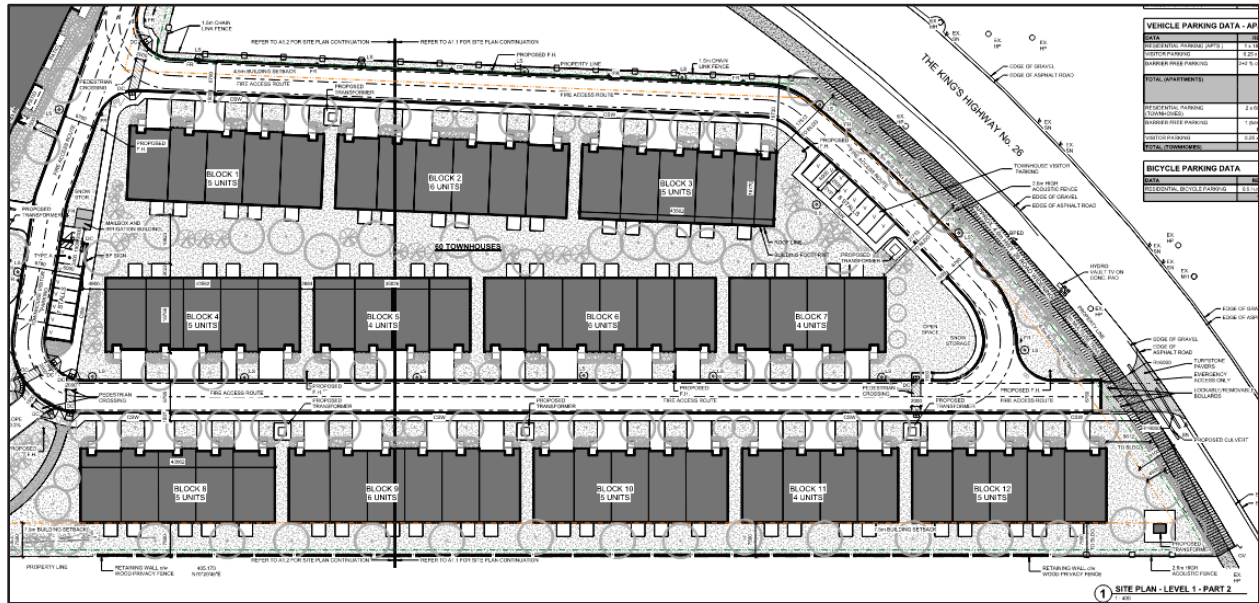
Site Plan excerpt showing the proposed 60 townhouse dwellings.
